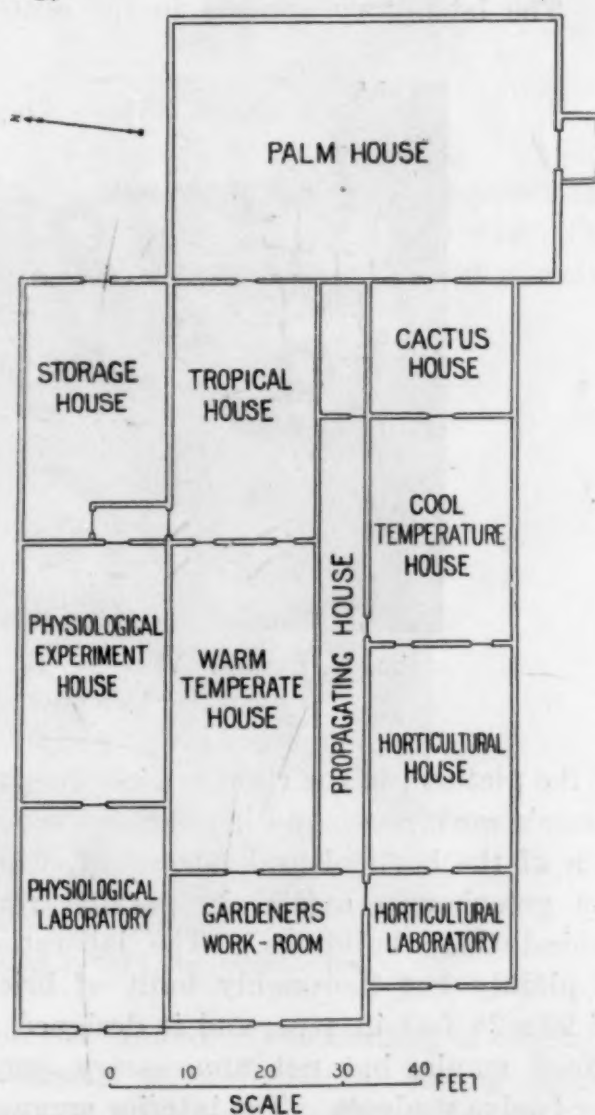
Ground-Plan of the Lyman Plant House at Smith College.
